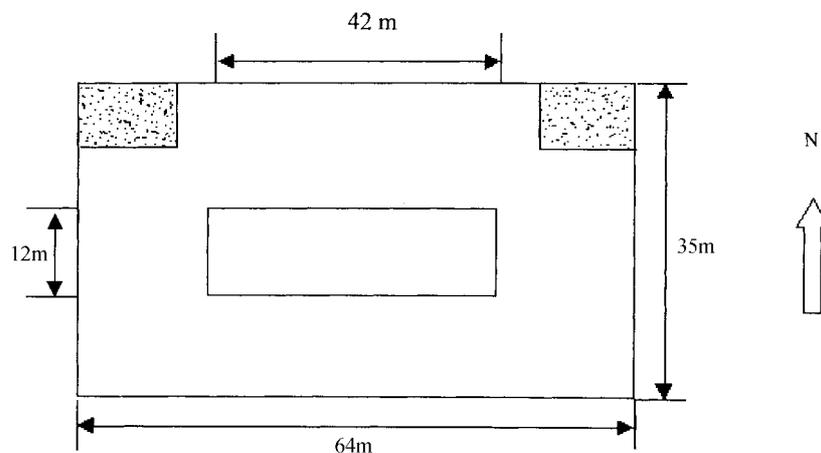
Layout details of existing building – Example II (SHAPE 1)
